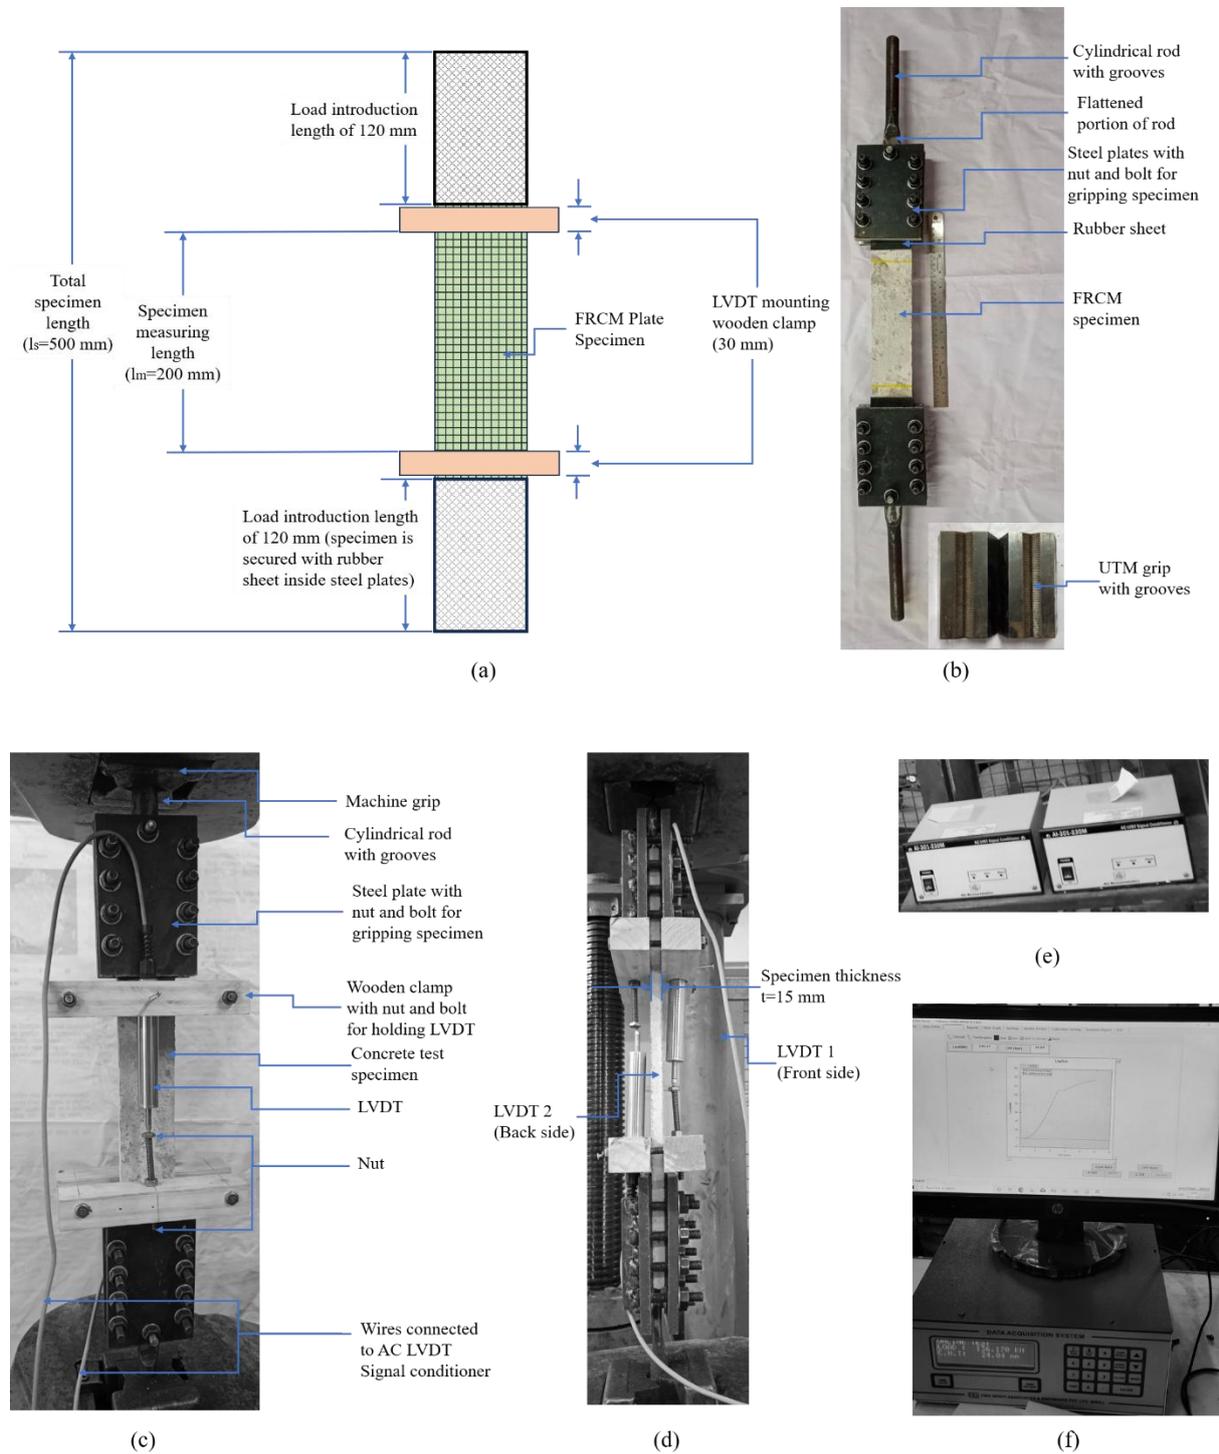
Test specimen configuration for uniaxial tensile test for FRCM specimens: (a) schematic representation, (b) actual FRCM specimen gripped inside steel plate, (c) front view of experimental set-up with LVDT, (d) side view of experimental set-up with LVDT, (e)
